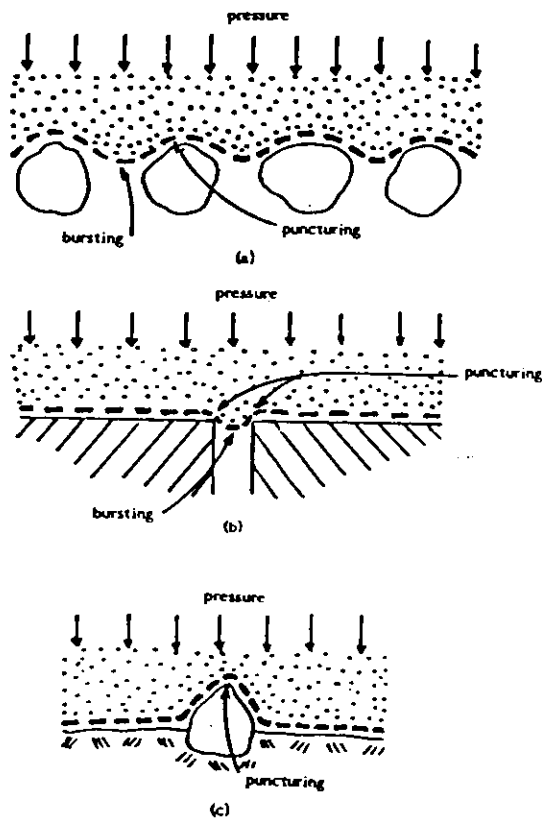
Typical situations of a geotextile separator between fine soil and (a) stone bed; (b) solid material such as concrete, rock or boards with cracks or gaps; (c) isolated stones.
